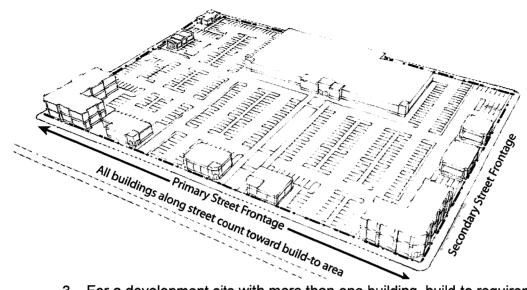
Build-To Area for Development Site with Multiple Buildinas The required primary and secondary street build-to areas may be fulfilled by more than one building. Build-to requirements only apply to those buildings closest to the street.
